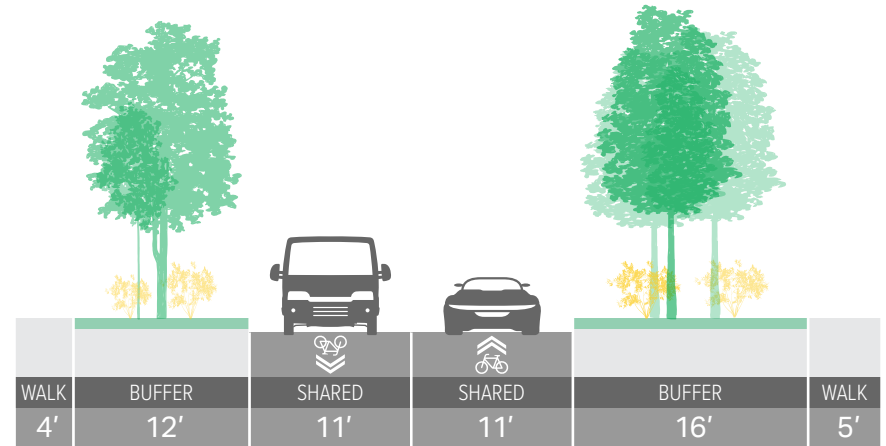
Proposed Cross-Section Winter Street to Crockett Street
